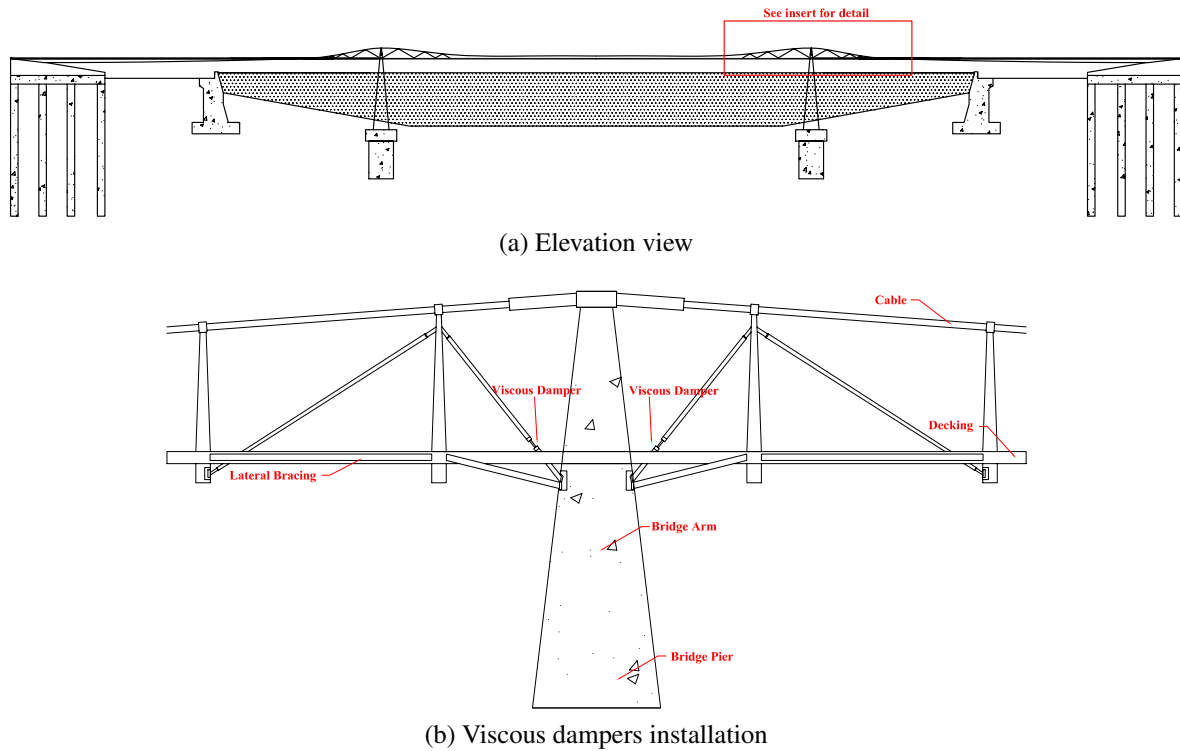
Installation of viscous dampers upon a long-span bridge. Figures drawn from plans originally designed by Arup (2011).
